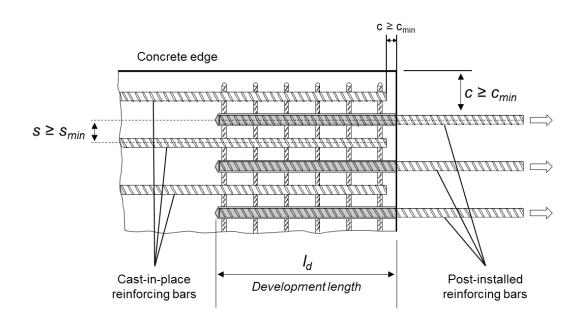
INSTALLATION PARAMETERS FOR POST-INSTALLED REINFORCING BARS
